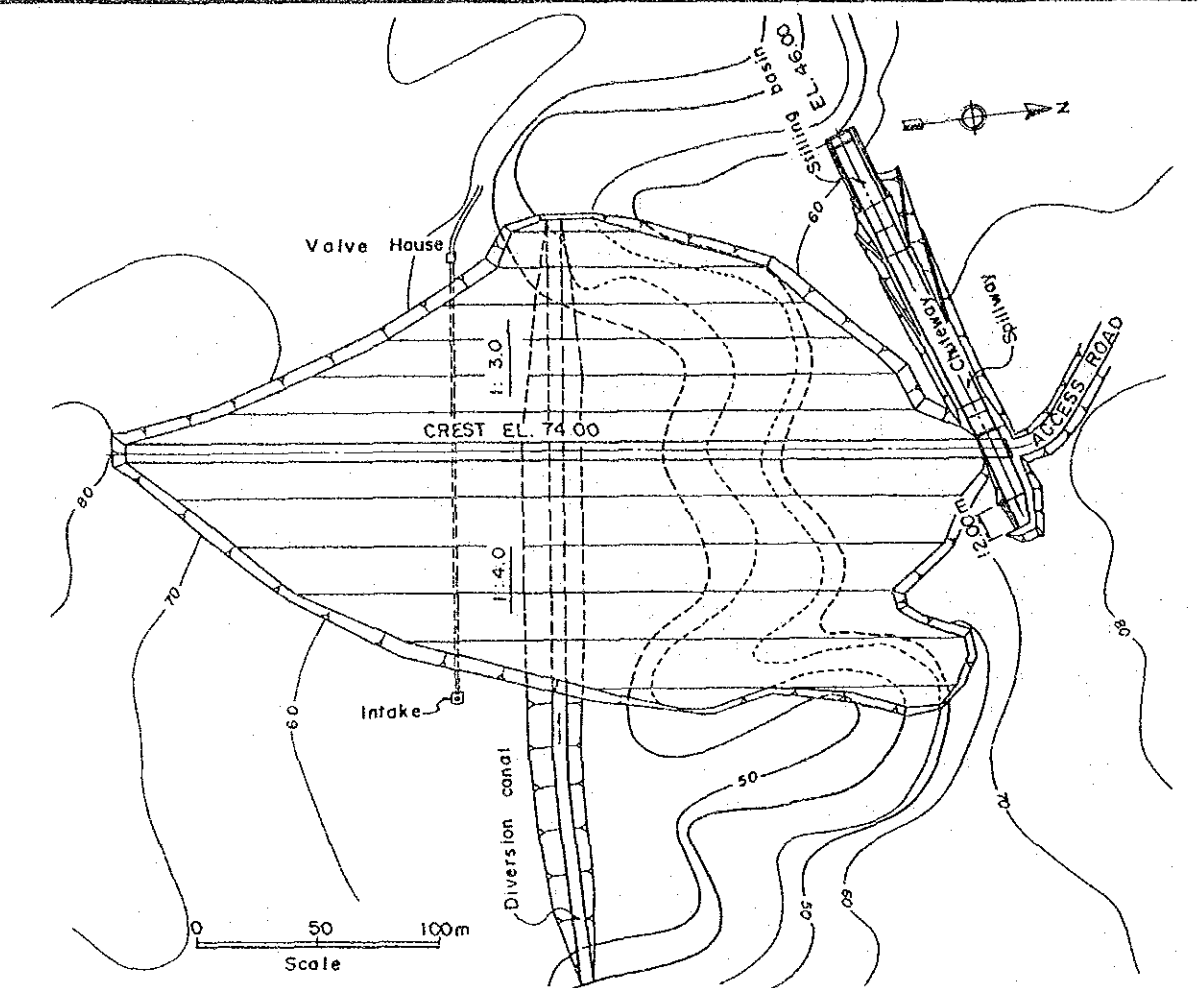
LAYOUT PLAN OF SAN VICENTE DAM
